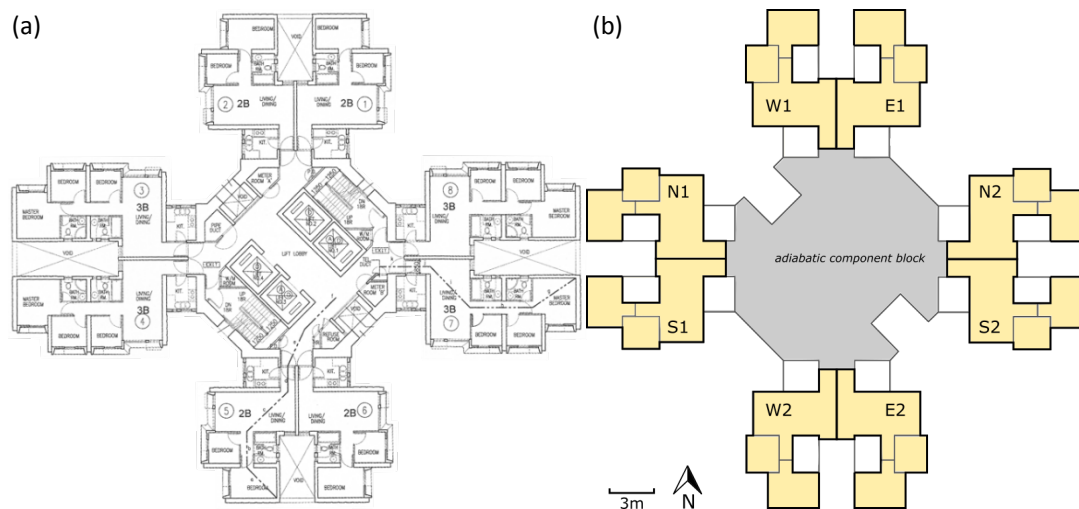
(a) Building layout plan of a Concord type PRH and (b) a simplified layout used for building simulation (only the parts highlighted in yellow were considered in thermal calculations). Flats facing different orientations are labelled accordingly.
